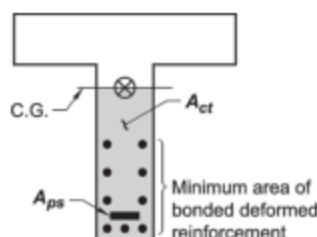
Area of minimum bonded deformed longitudinal reinforcement distribution.
